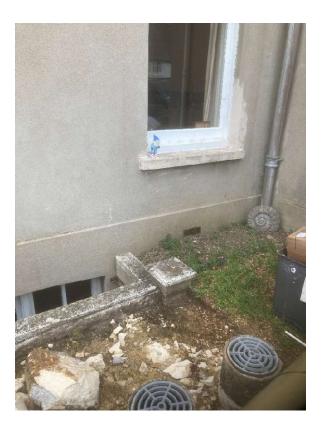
Photograph showing the south-east elevation windows to the living room and basement (left)
